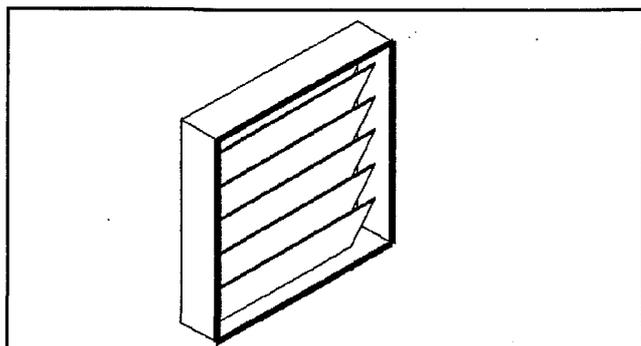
Ventilation and cooling fans should be equipped with anti-backdraft shutters.
